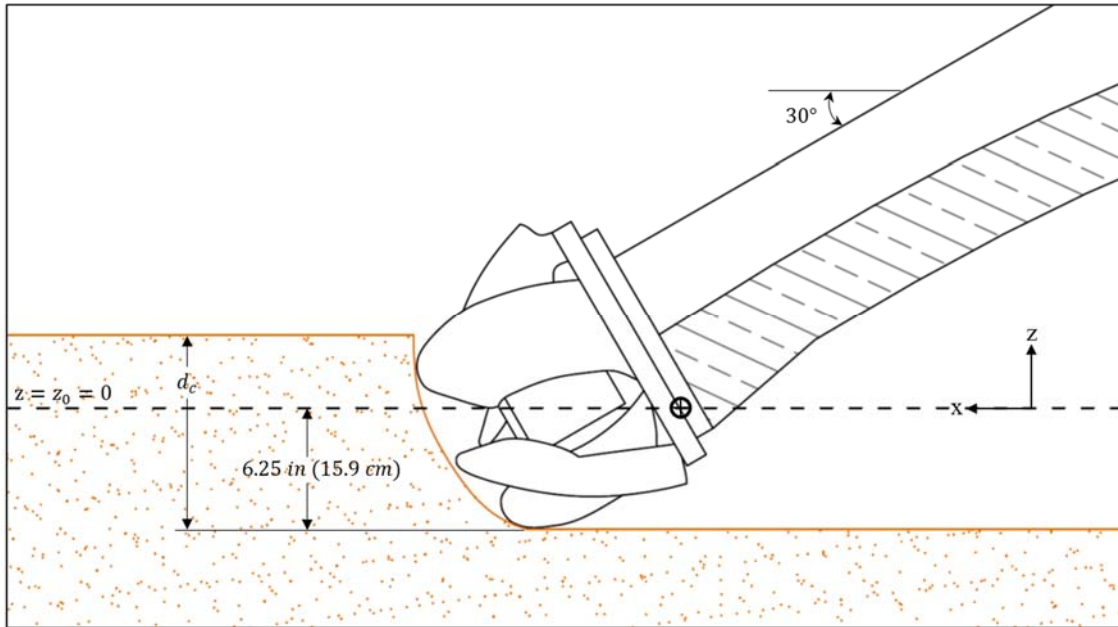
Cutting thickness at a 30° ladder angle with the model cutter head.
